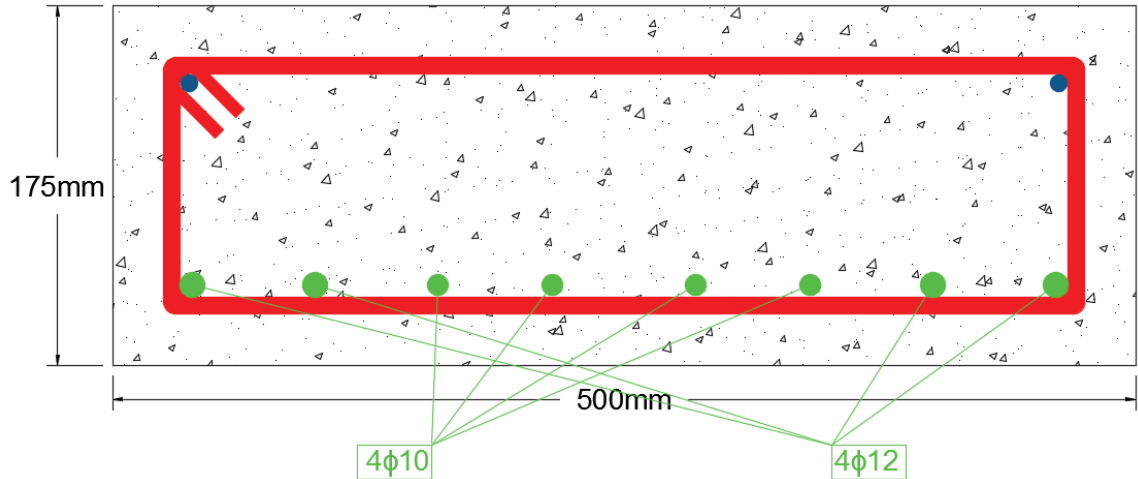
Cross Section of Over-Reinforced One-Way Concrete Slabs Sample
